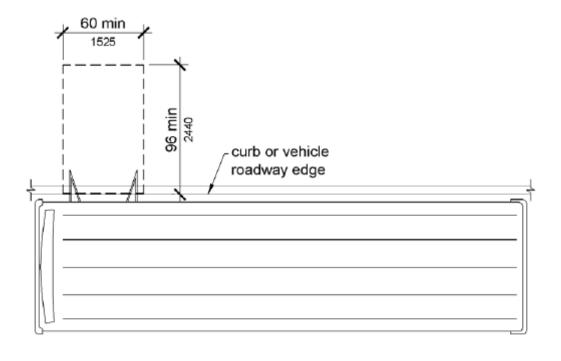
Typical Bus Stop Dimensions – Sidewalk Behind Parkway
